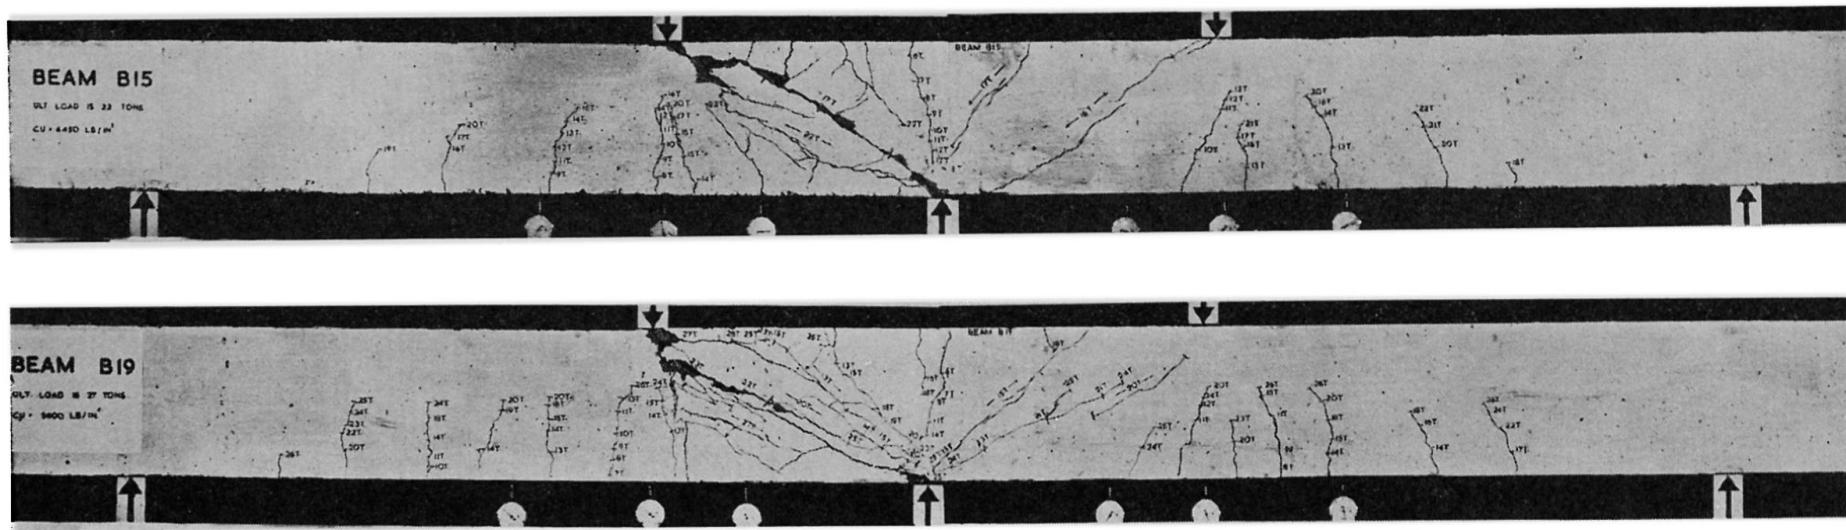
Beams with stirrups at  $2\frac{1}{2}$ " centres:
